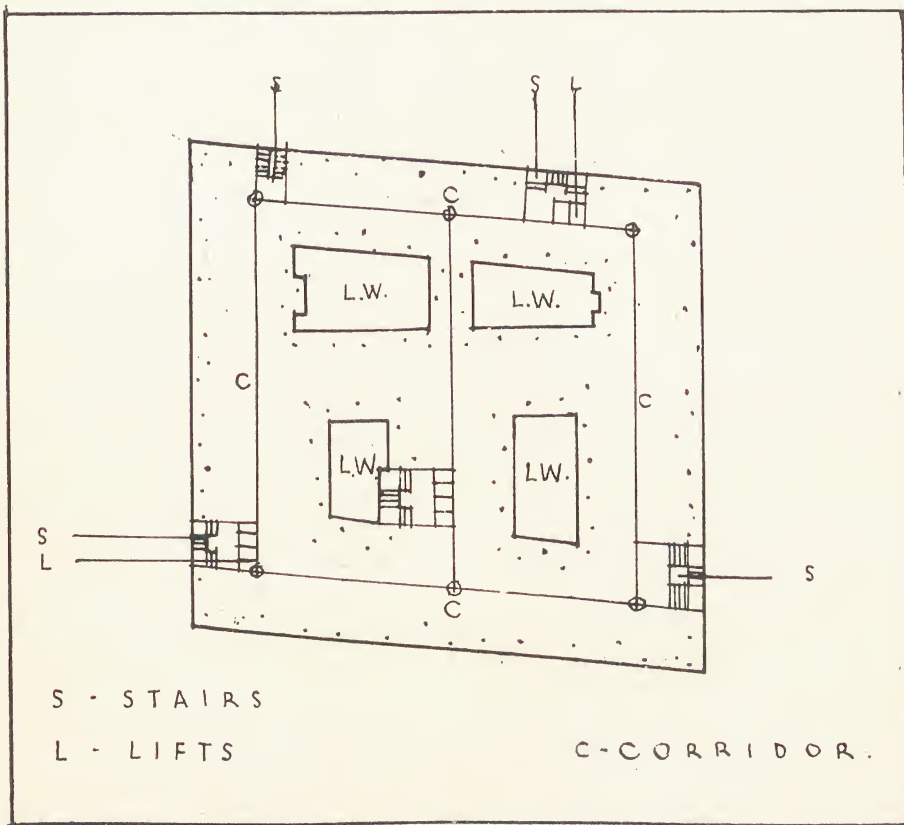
DIAGRAMMATIC ARRANGEMENT OF STAIRS, LIFTS, ETC., ON UPPER FLOORS
